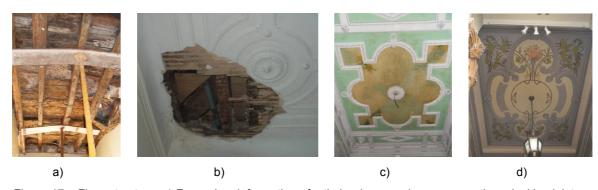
Floor structure: a) Excessive deformation of a timber beams where apparently no locking joist were use; b) Ceiling finished with laths and plaster (Branco, 2007); c) and d) Examples of ceiling covered by stucco details and frames (Andrade, 2011).
